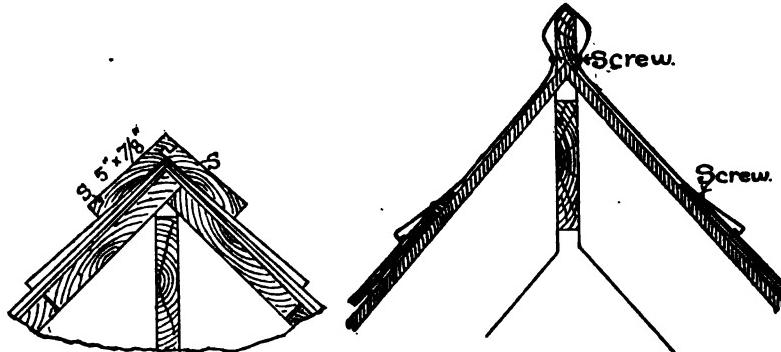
Detail of Wooden Ridge, Showing Saddle-Boards.
